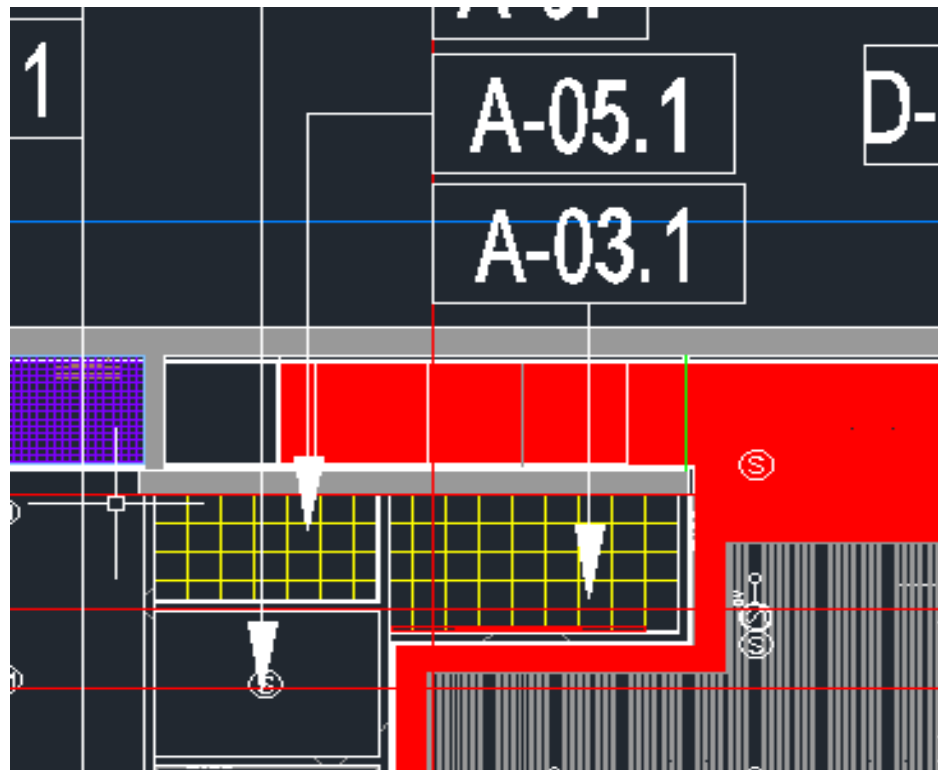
AutoCAD layout (Floor Plan) of Audit & Cash Store Room (A-05.1)
